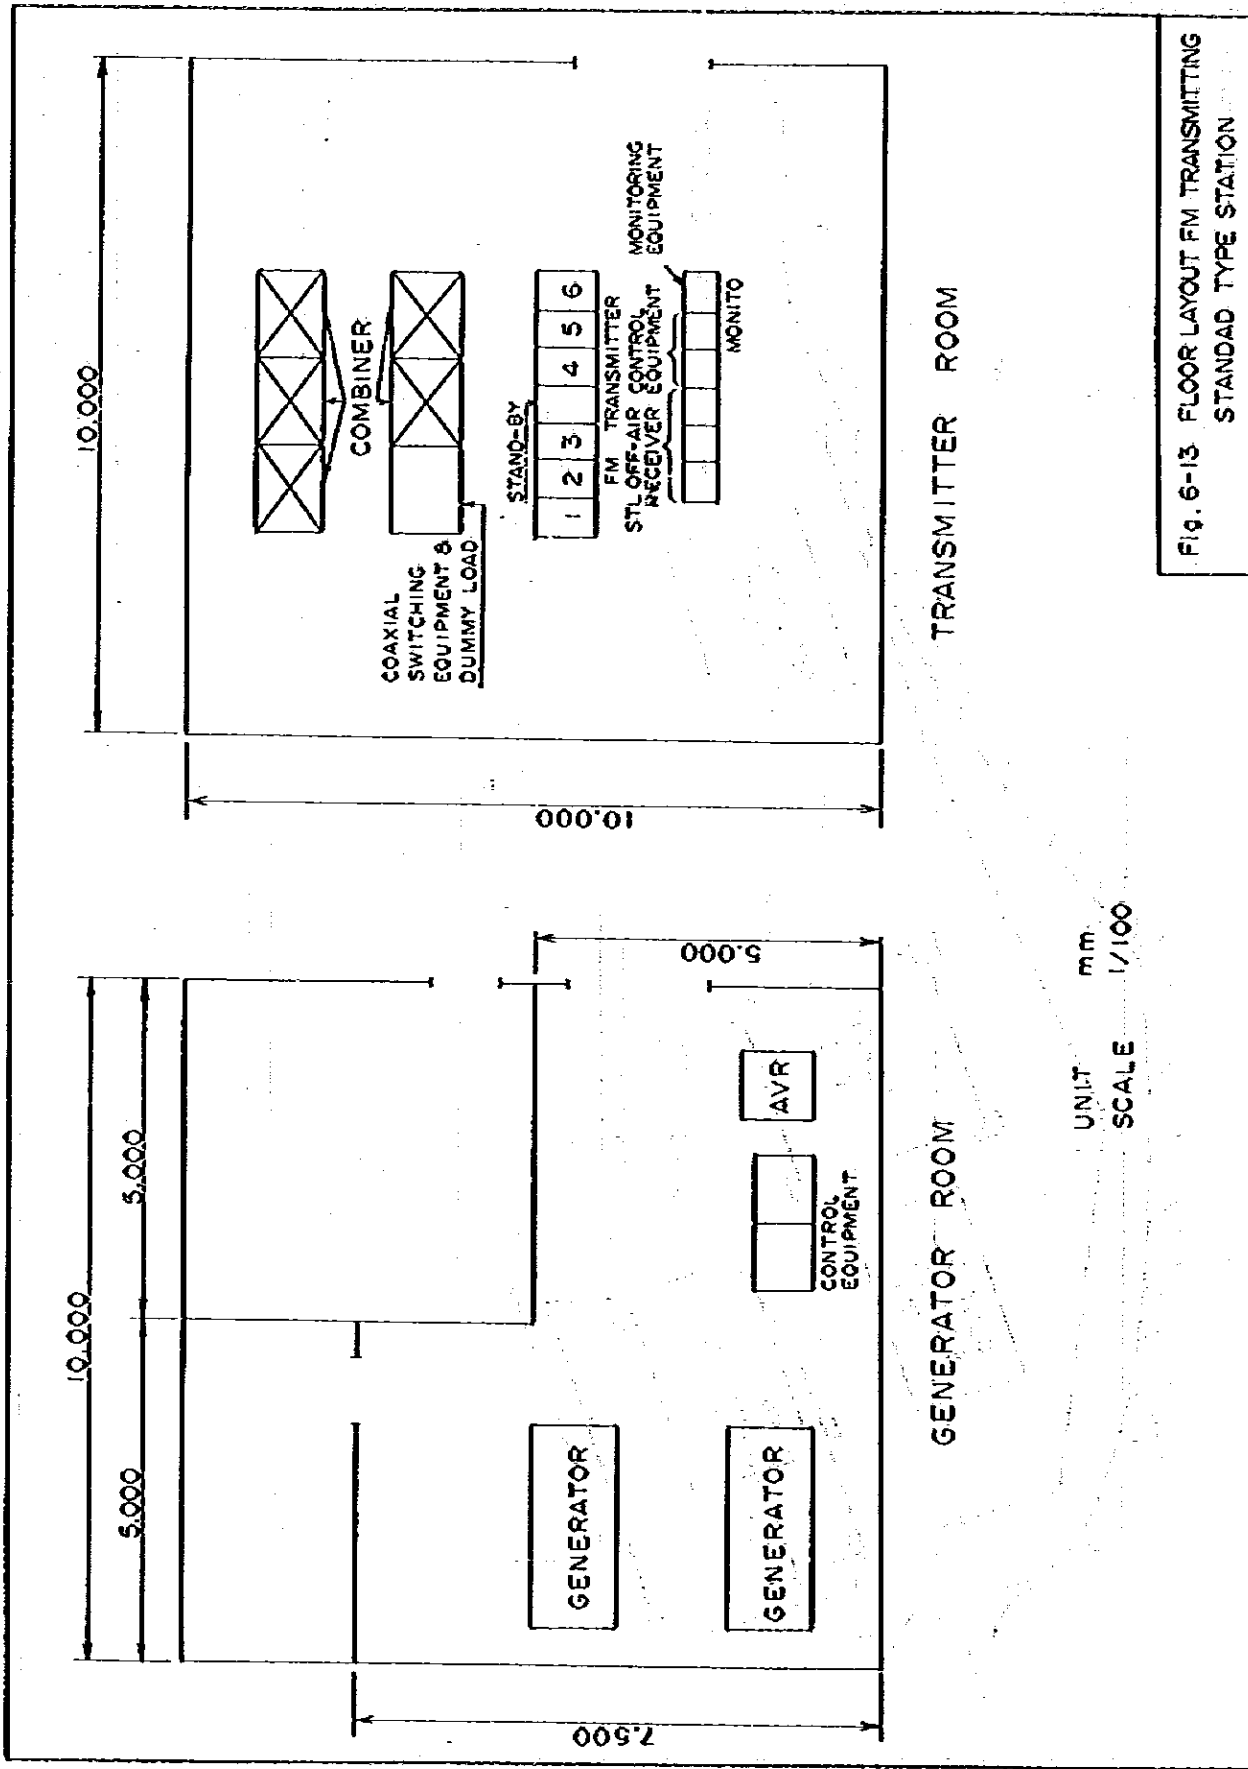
FLOOR LAYOUT FM TRANSMITTING STANDAD TYPE STATION
